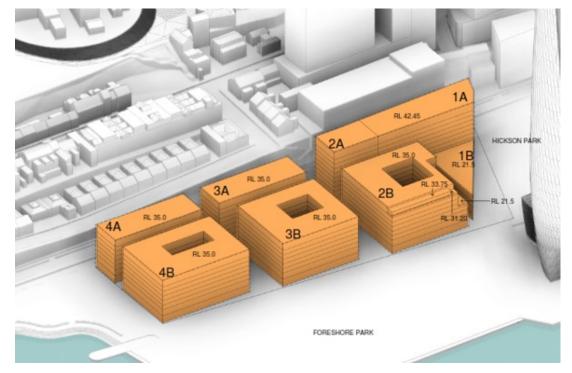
The Central Barangaroo development, showing the boundaries and proposed amended MOD 9 envelopes of Block 5 (buildings 1A, 1B, 2A and 2B), Block 6 (buildings 3A and 3B) and Block 7 (buildings 4A and 4B).
